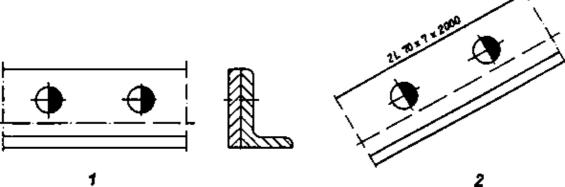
Rivet joint with two rivets (16 mm in diameter)
